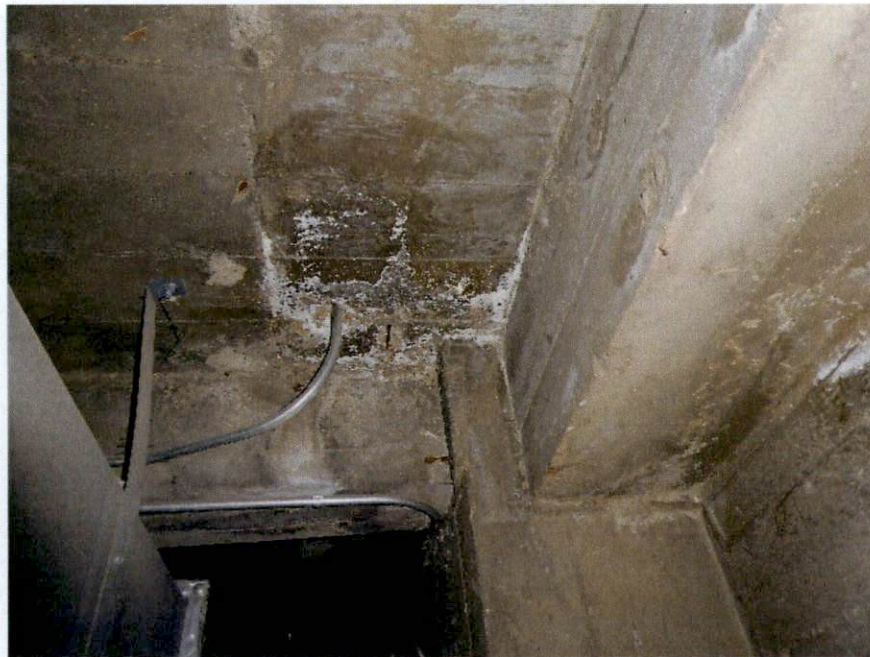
Efflorescence at hole in concrete for conduit – Tenth Floor.
